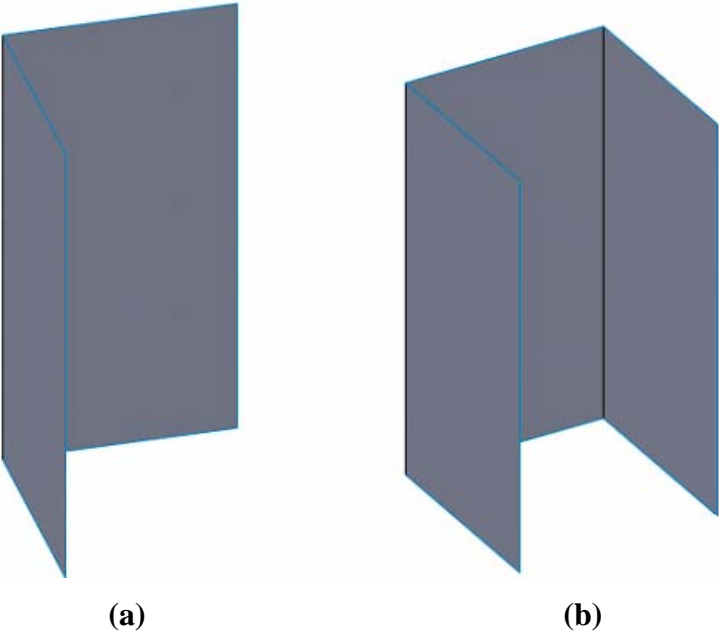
The finite element models of (a) two joint walls and (b) three joint walls
